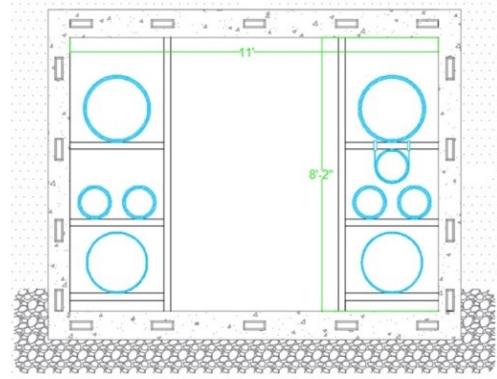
Cross-section of the precast concrete tunnel (BYU, 2015)
